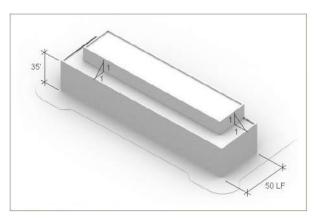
RETAIL MAIN STREET STEPBACK WRAPS CORNERS
